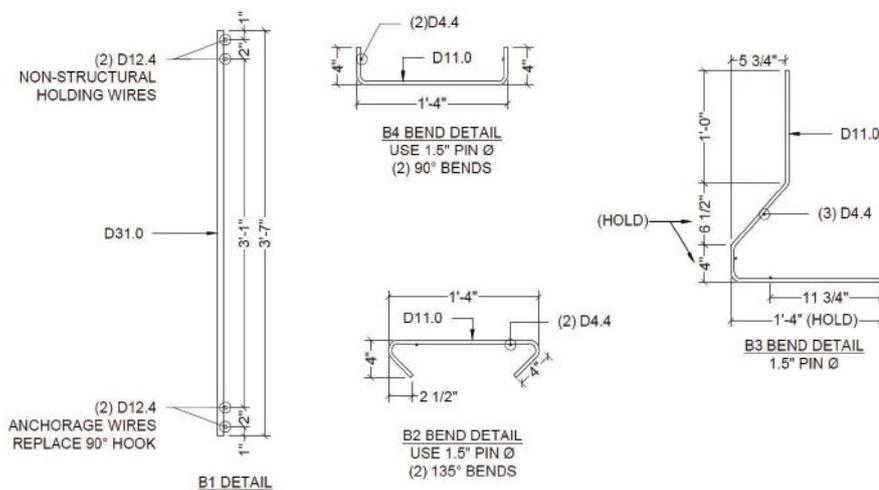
A mat diagram in a typical WWR submittal shows welded wire reinforcement sectional geometry, wire size, and bend arrangement.
